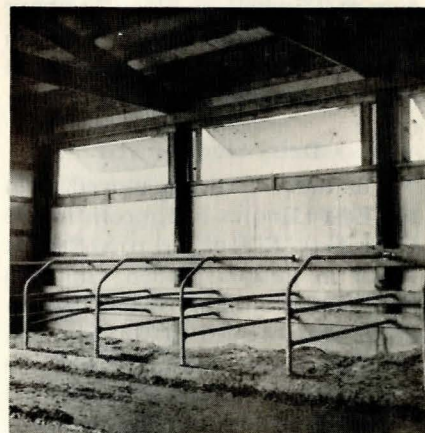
Another way of opening up a building is to provide panels in the side wall.
